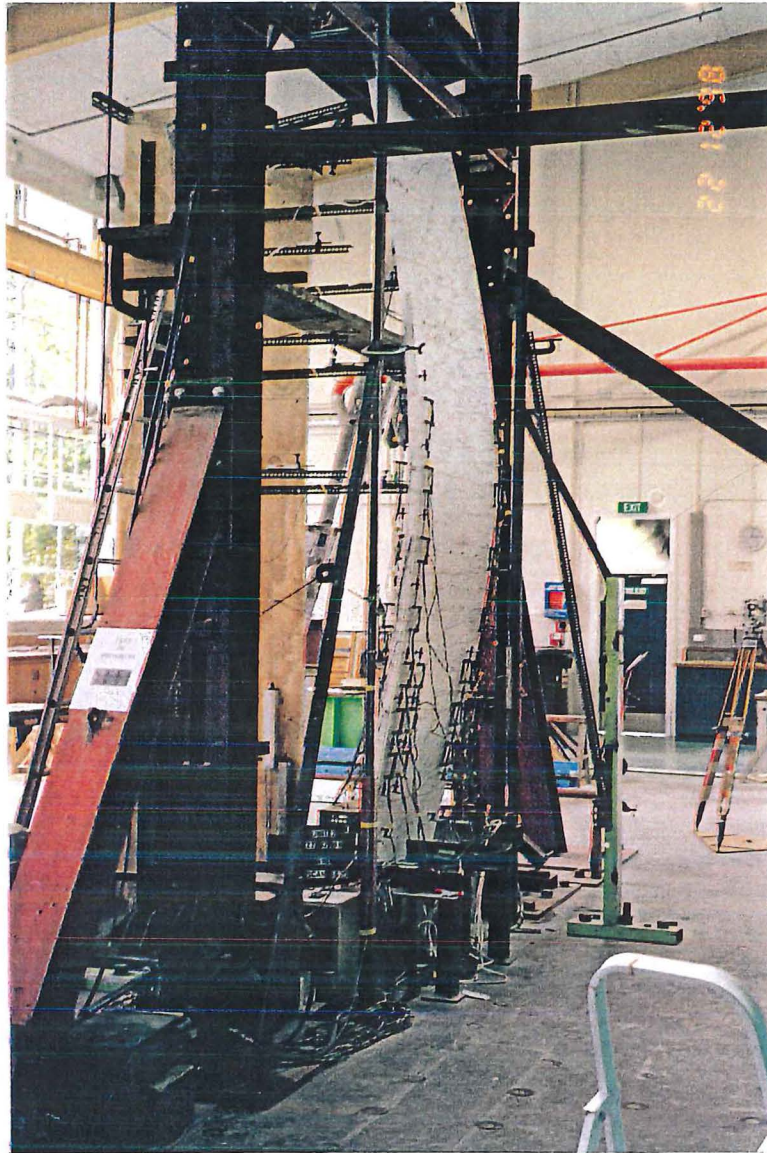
Unit 2: Overall wall profile at the end of test (East edge)
